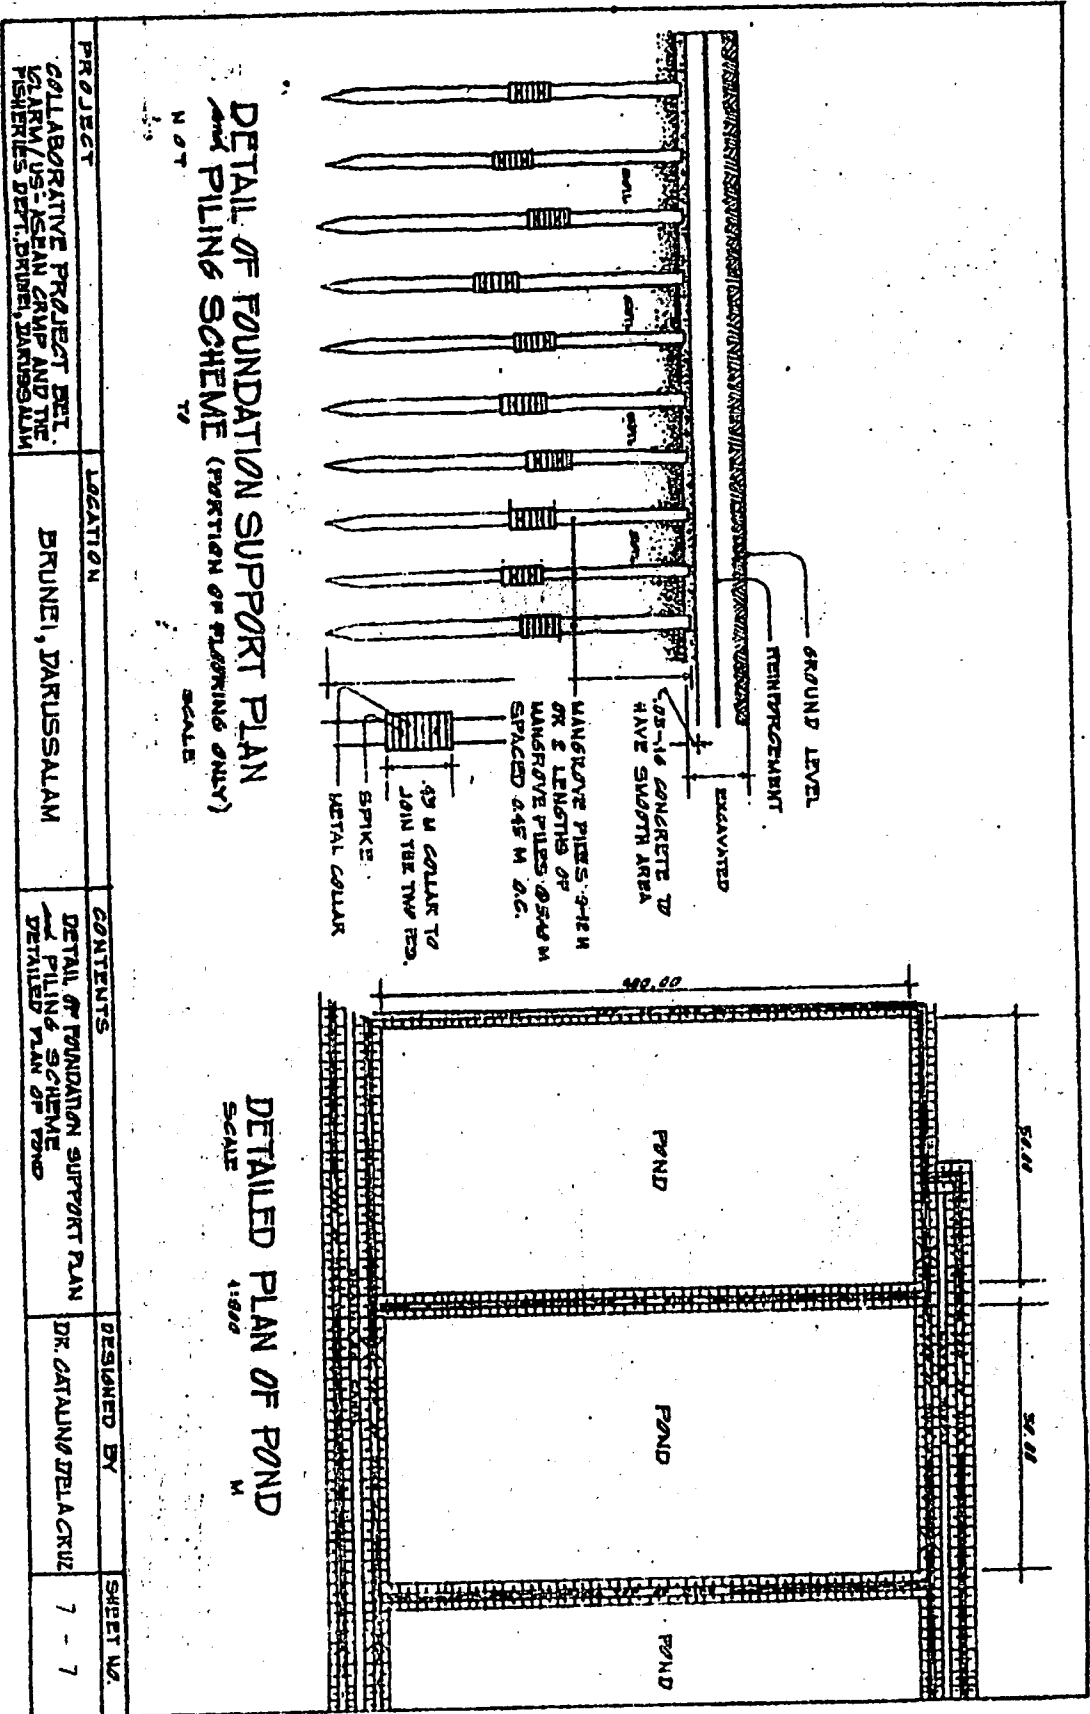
Cross section of gate foundation plan and plan of earthen ponds.
